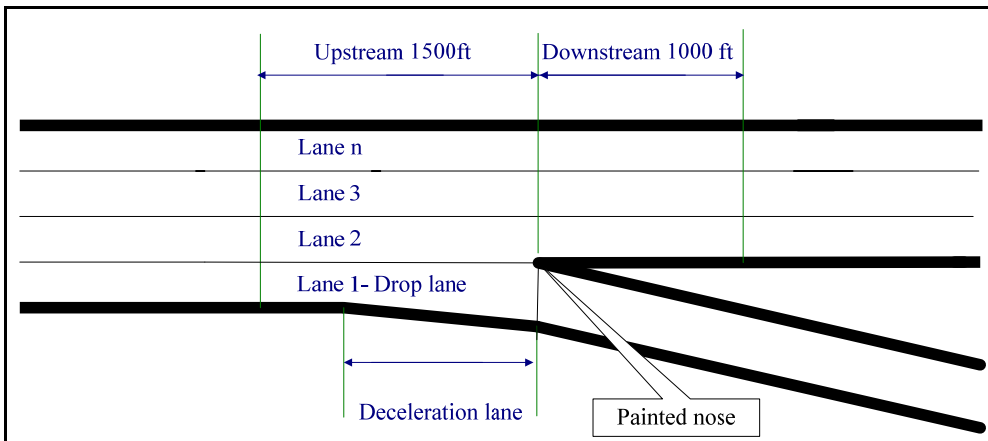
Type 2 Exit Ramp Length: Single-lane Exit Ramp without a Taper
